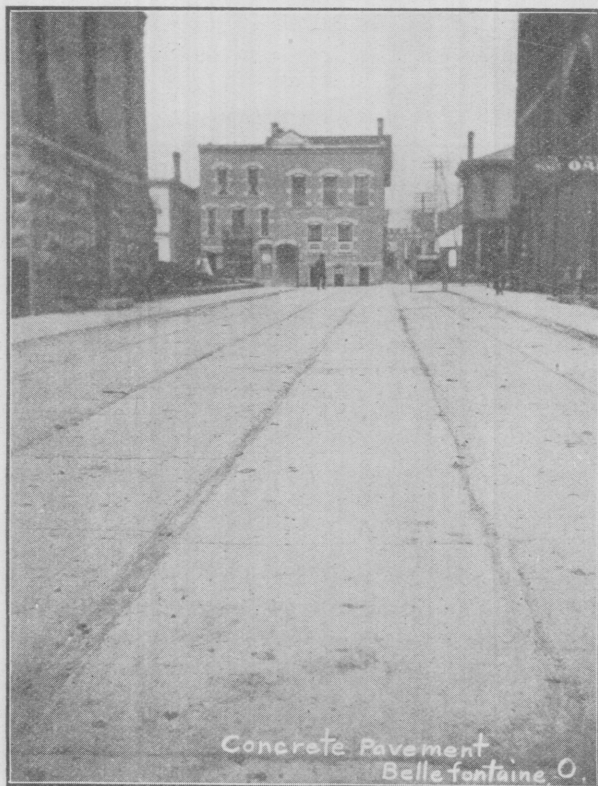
Concrete Pavement at Bellefontaine, Ohio, Showing Longitudinal Wheel Marks.
